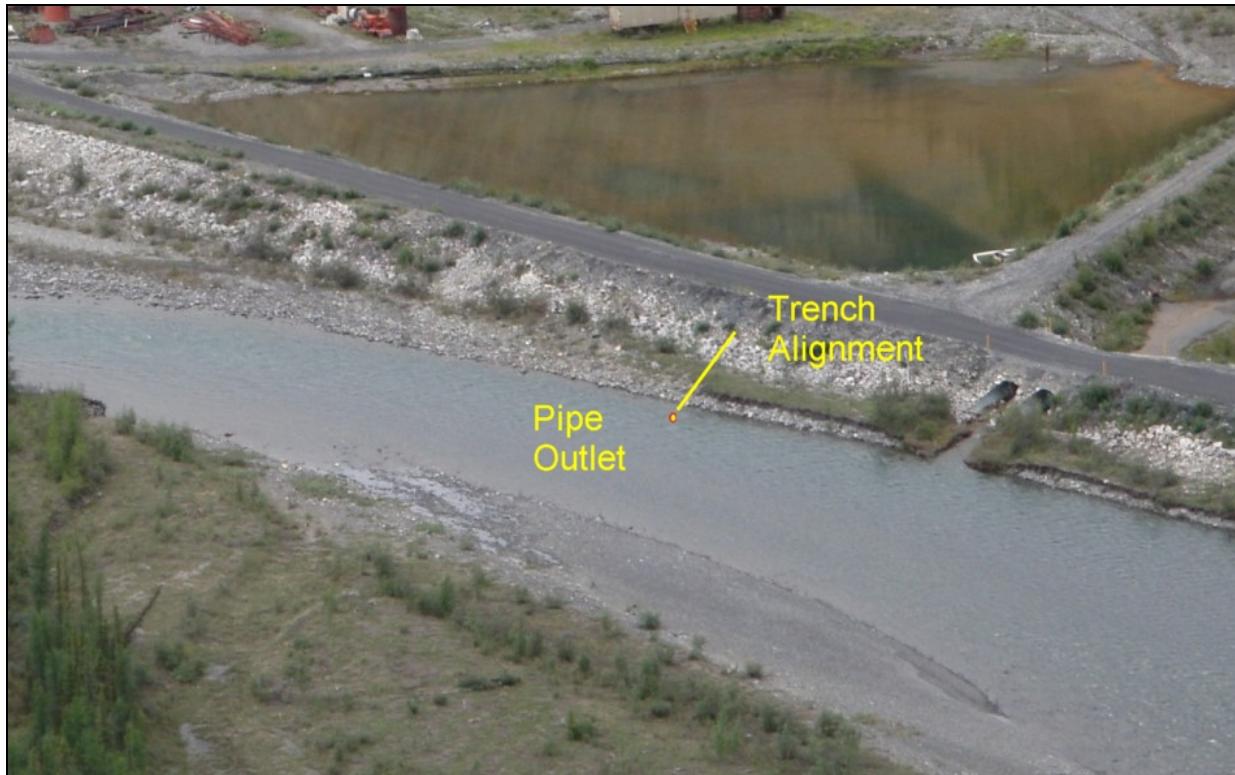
Proposed location of pipe outlet from catchment pond to Prairarie Creek. Flow is left to right.
